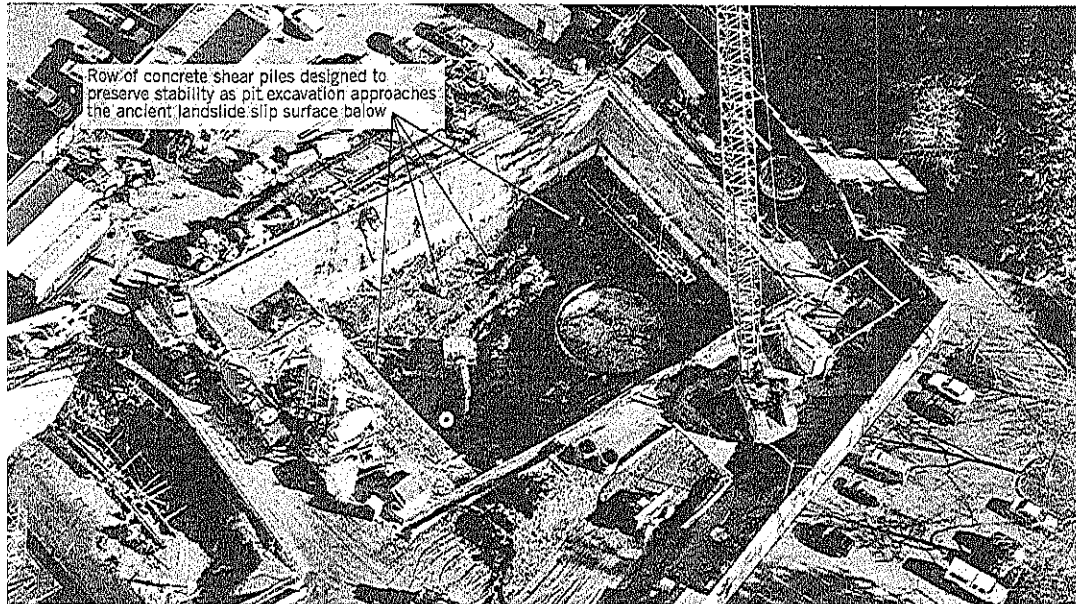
Washington Park Station. Aerial view of East Pit excavation in progress on February 13, 1996. Looking northeast.
